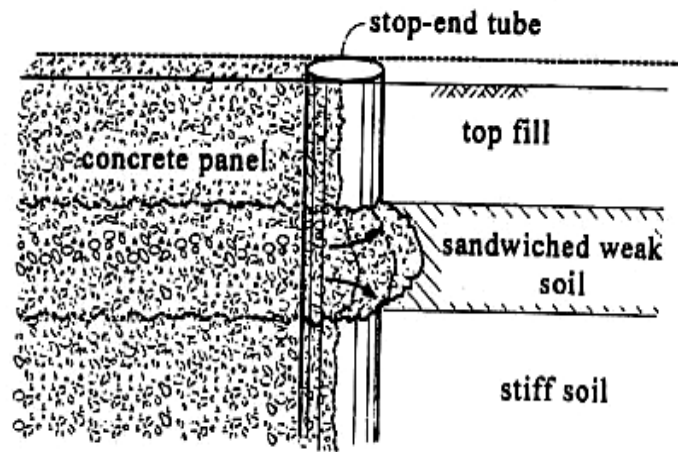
Penetration of Concrete beyond Stop-End Tube due to Falloff at Sandwiched Weak Soil
